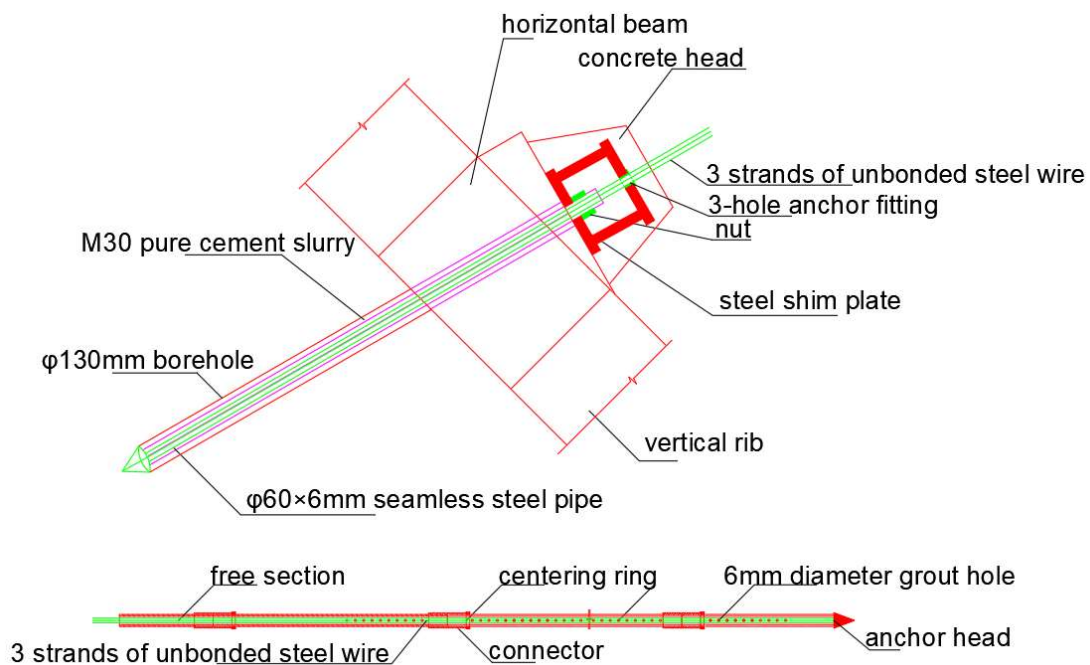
Schematic Diagram of Split Grouting Prestressed Steel Anchor Pipe and Cable Composite Structure
